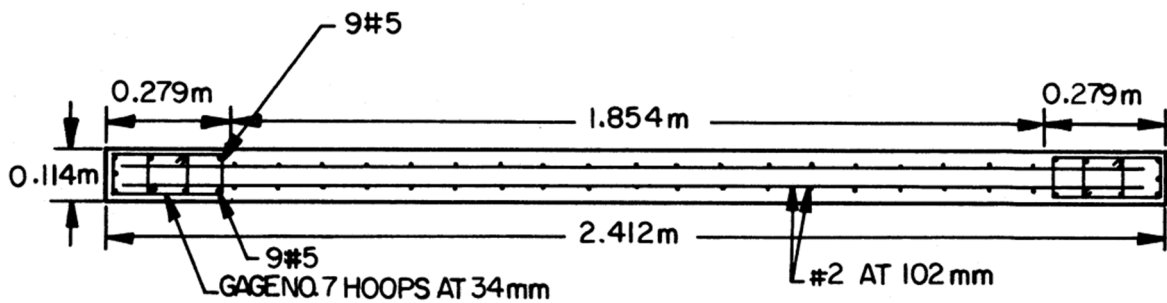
Detailed Cross-Section of Rectangular Wall (Vallenas et. al. 1979)
